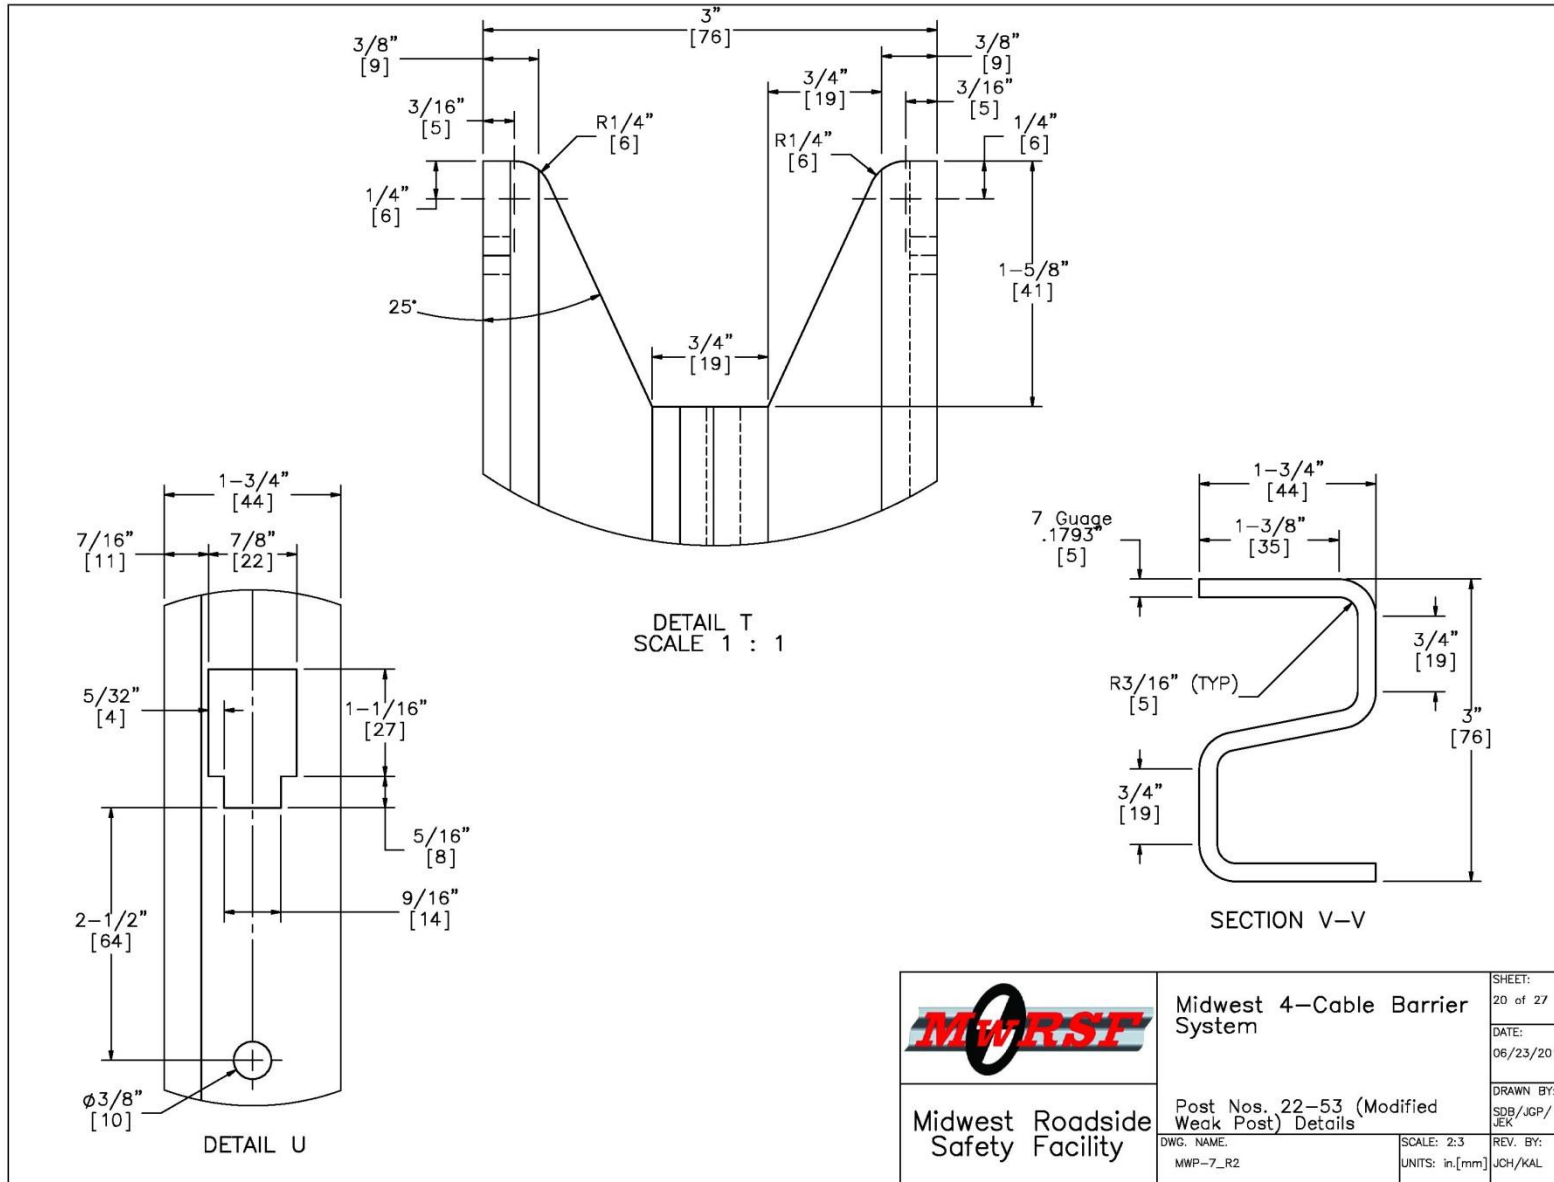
MWP Z-Post Details, Post Nos. 27 through 47, Test No. MWP-7
